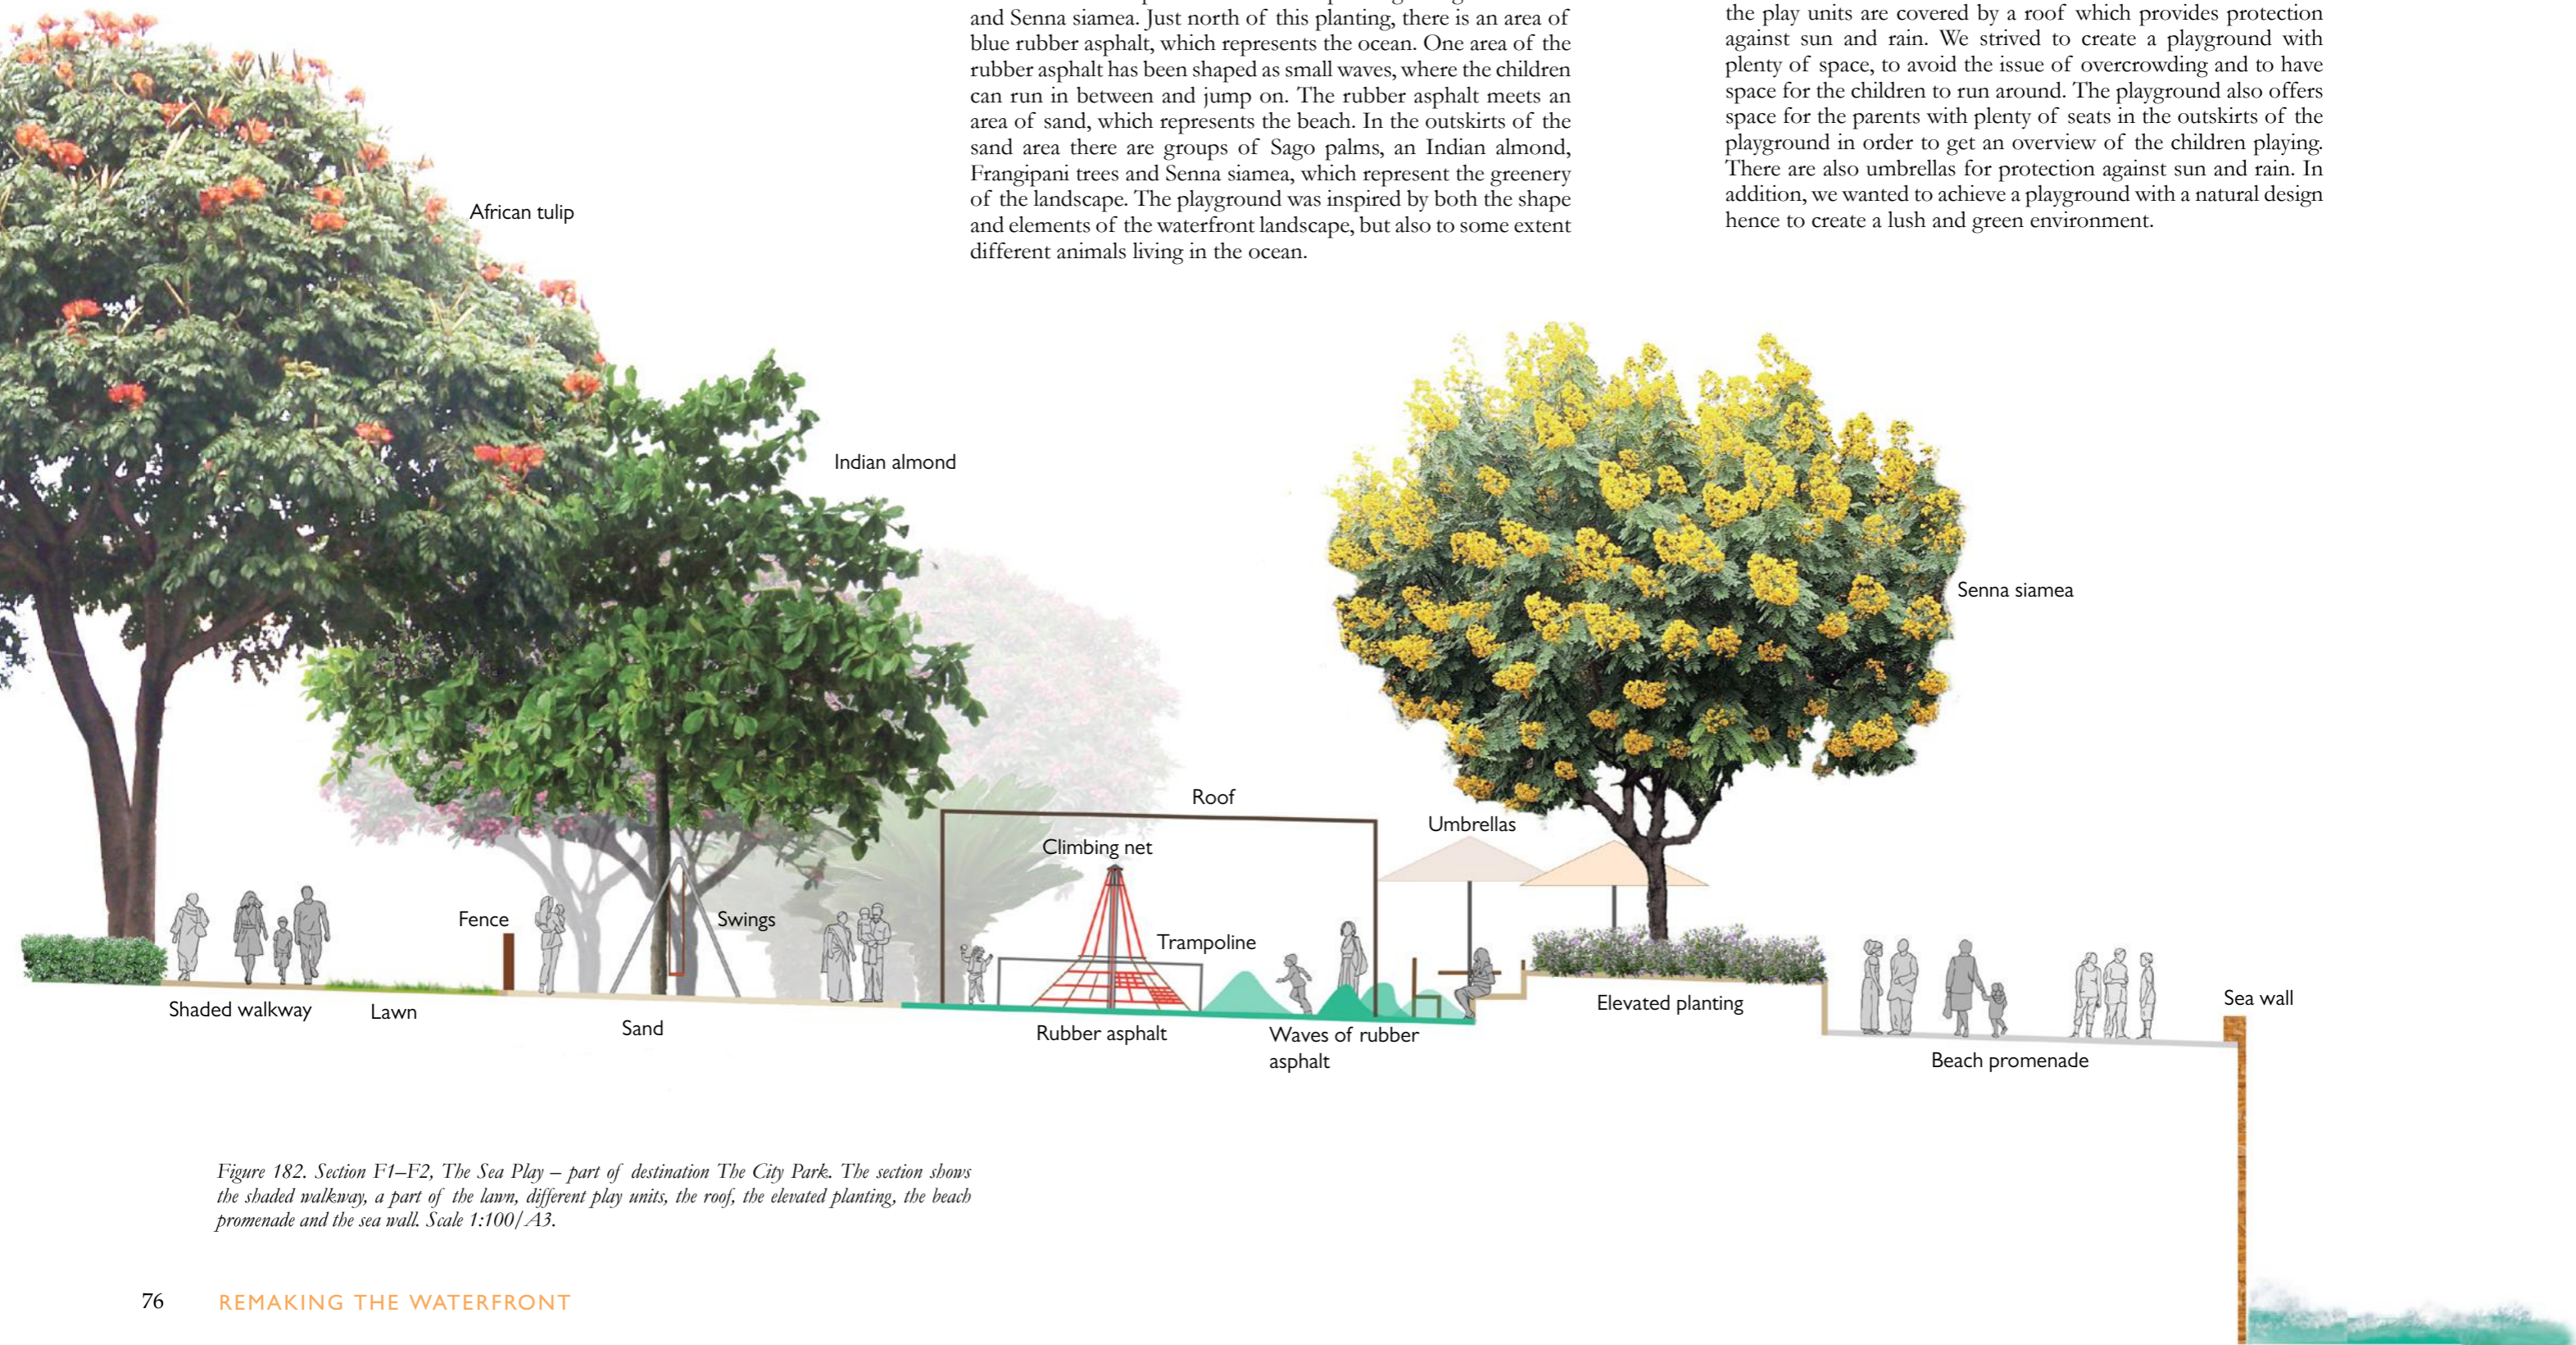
Section F1–F2, The Sea Play – part of destination The City Park. The section shows the shaded walkway, a part of the lawn, different play units, the roof, the elevated planting, the beach promenade and the sea wall. Scale 1:100/A3.
